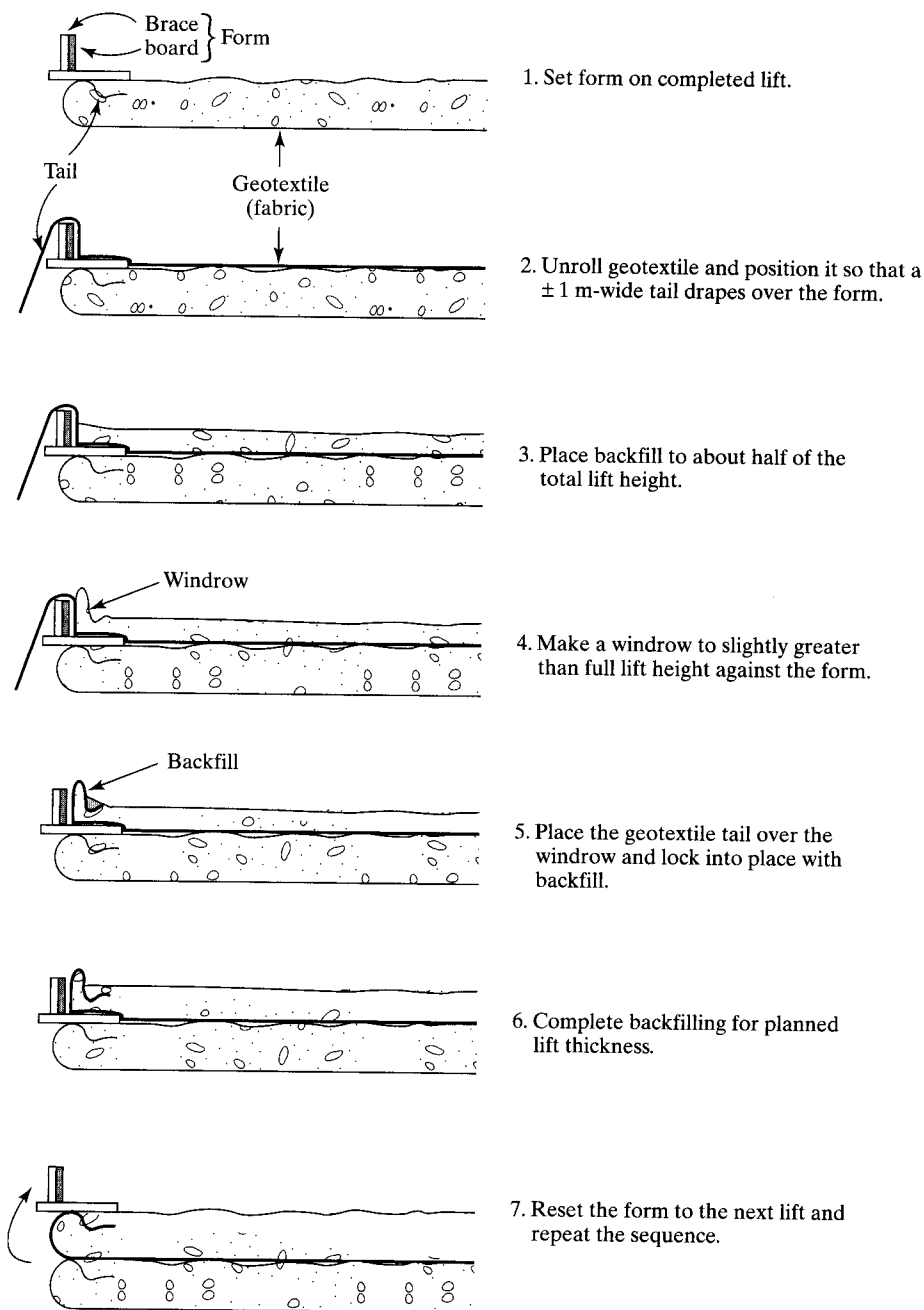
Construction sequence for geotextile wrap-around walls followed by U.S. Forest Service.
